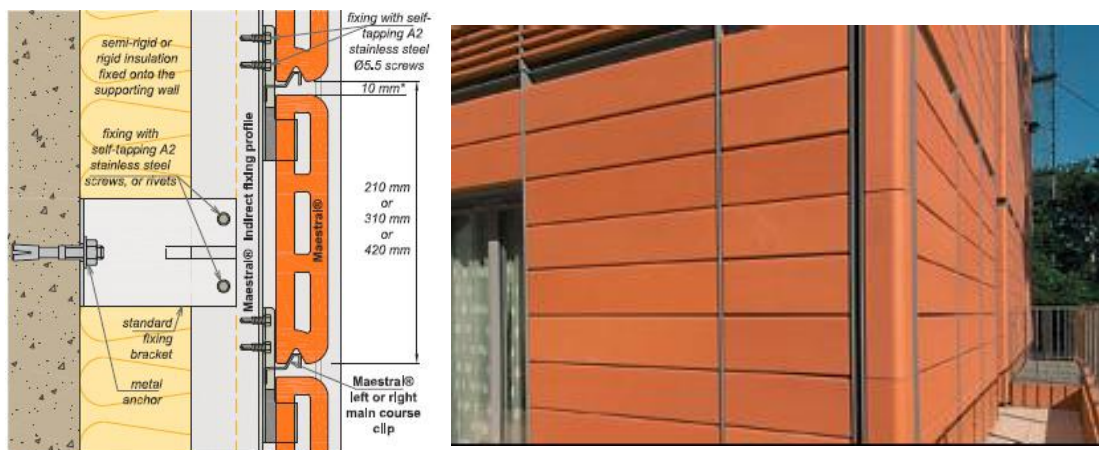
Terracotta panel facade style (Source:www.terreal.com)
